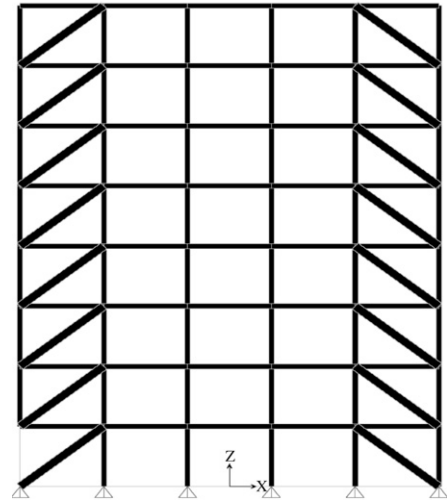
Steel bracing to external frames oriented such that they are under tension due to gravity loads used in Model 5.
